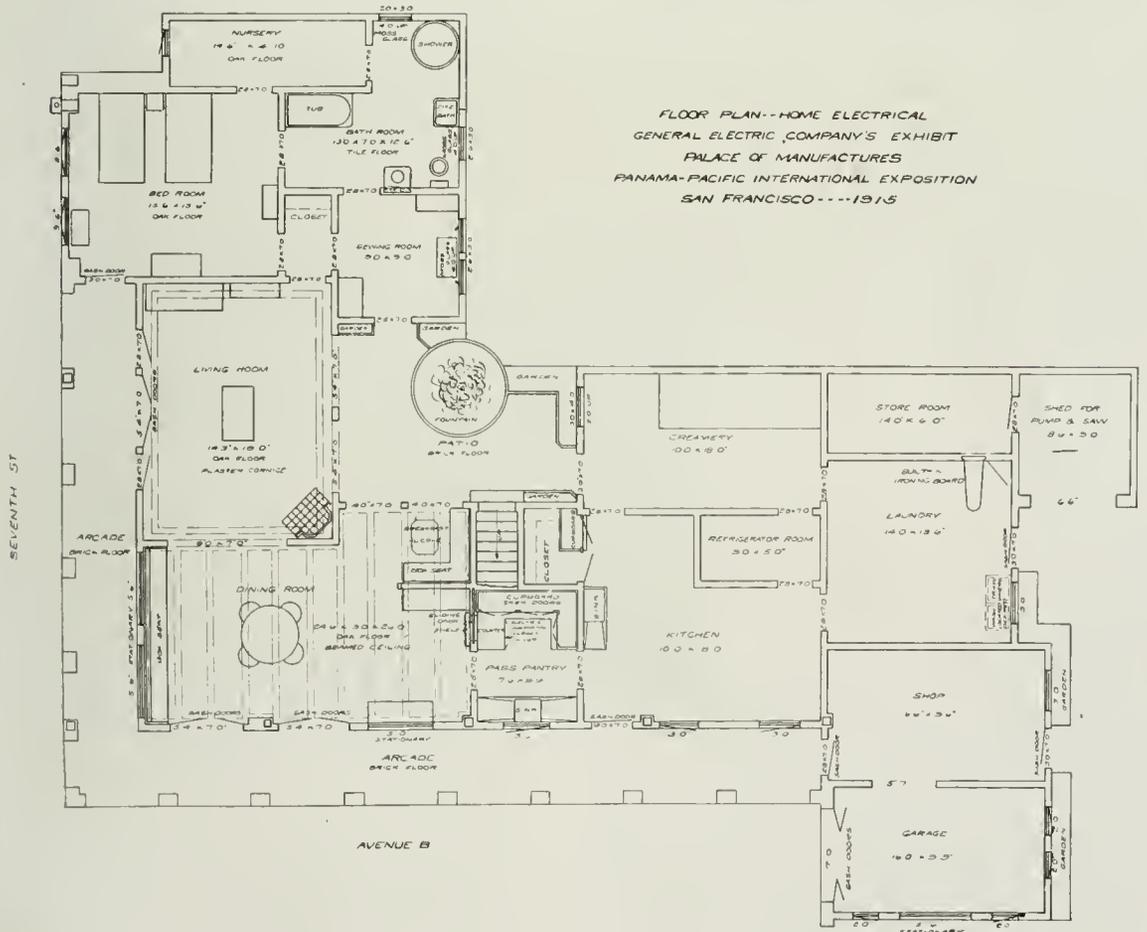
Floor Plan of the "Home Electrical" Exhibit
